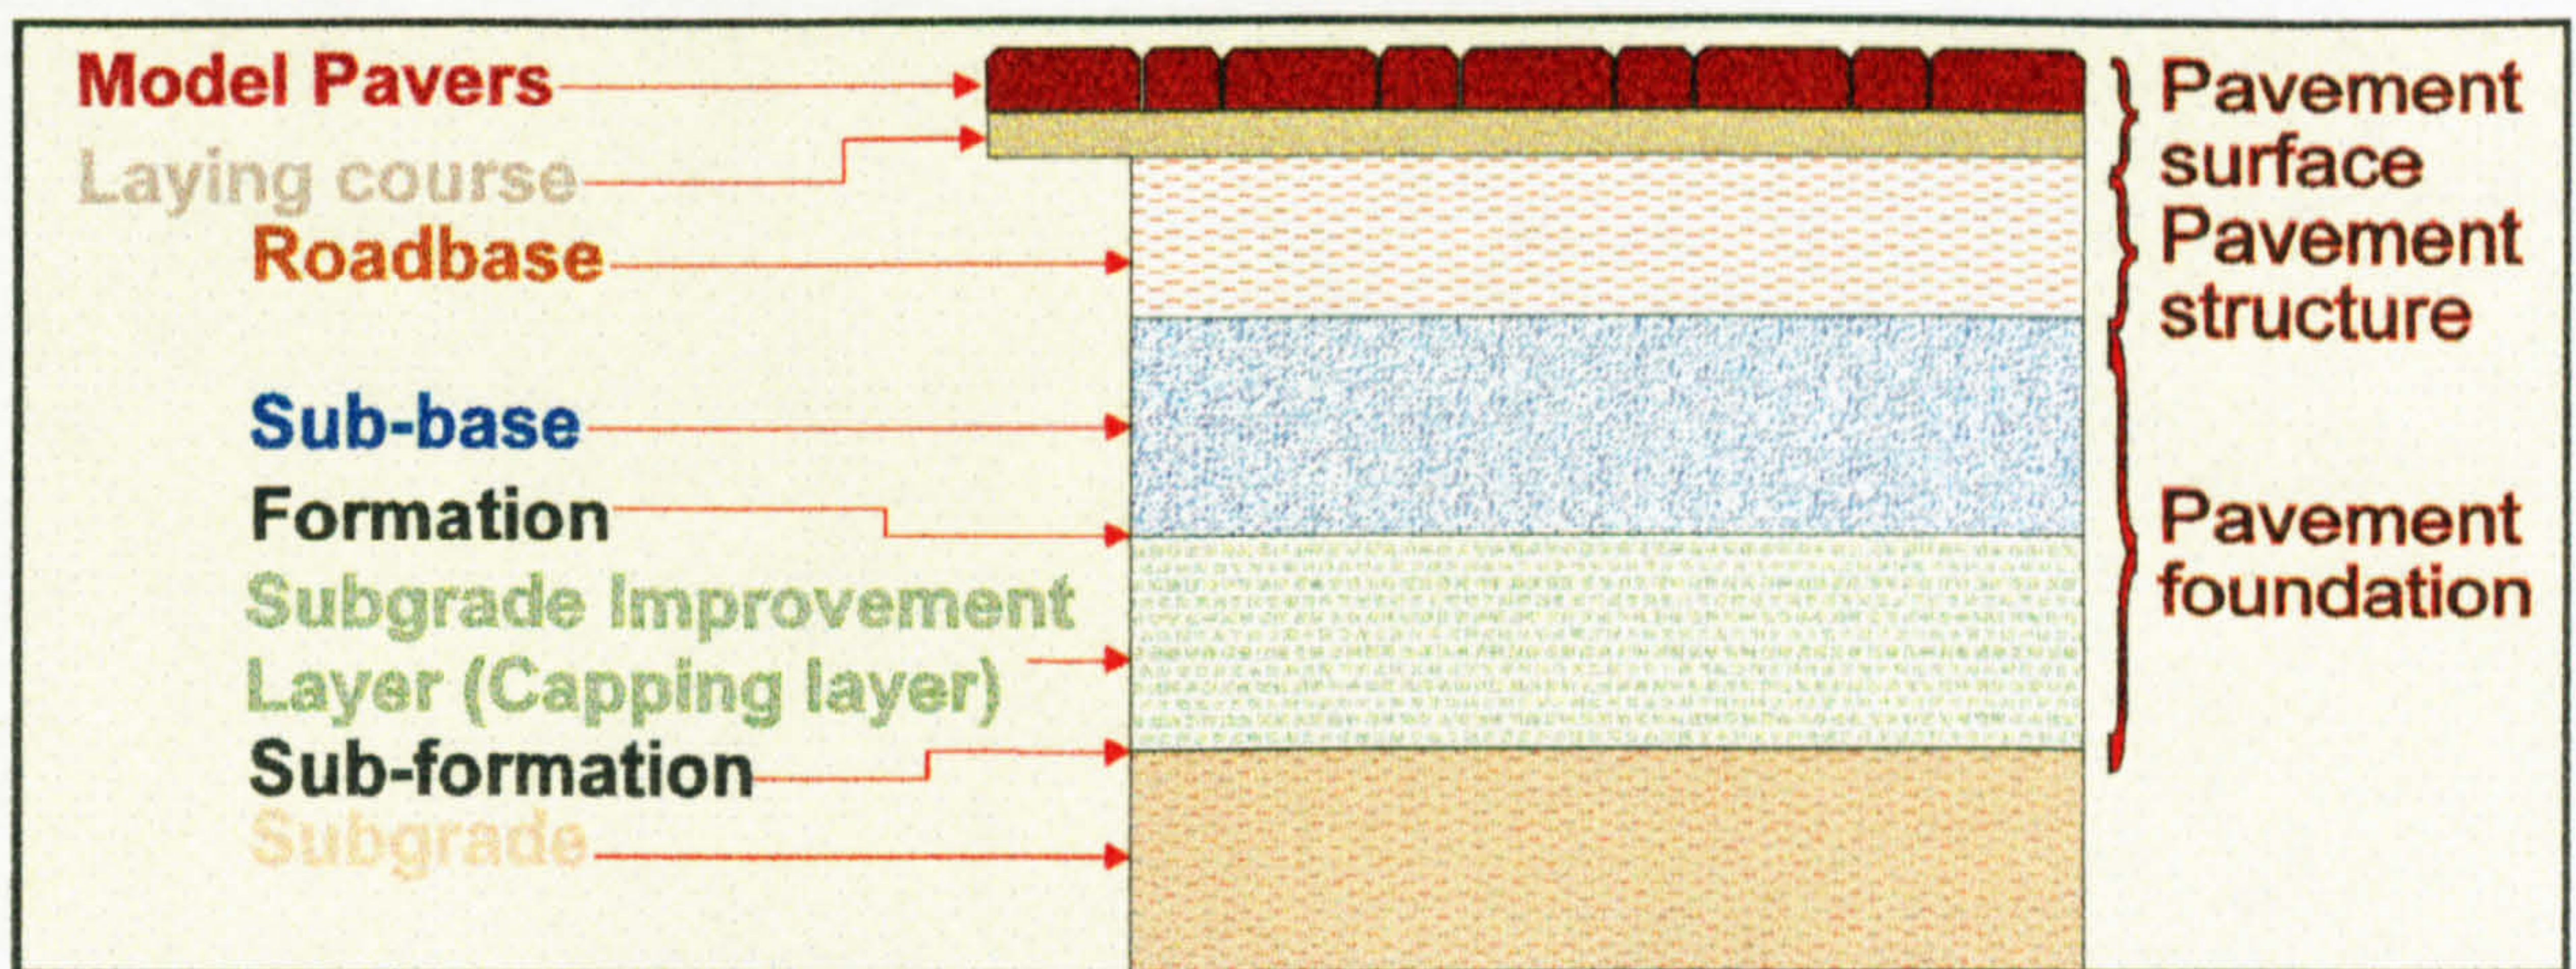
Typical cross section of a pavement surfaced with pavers.
